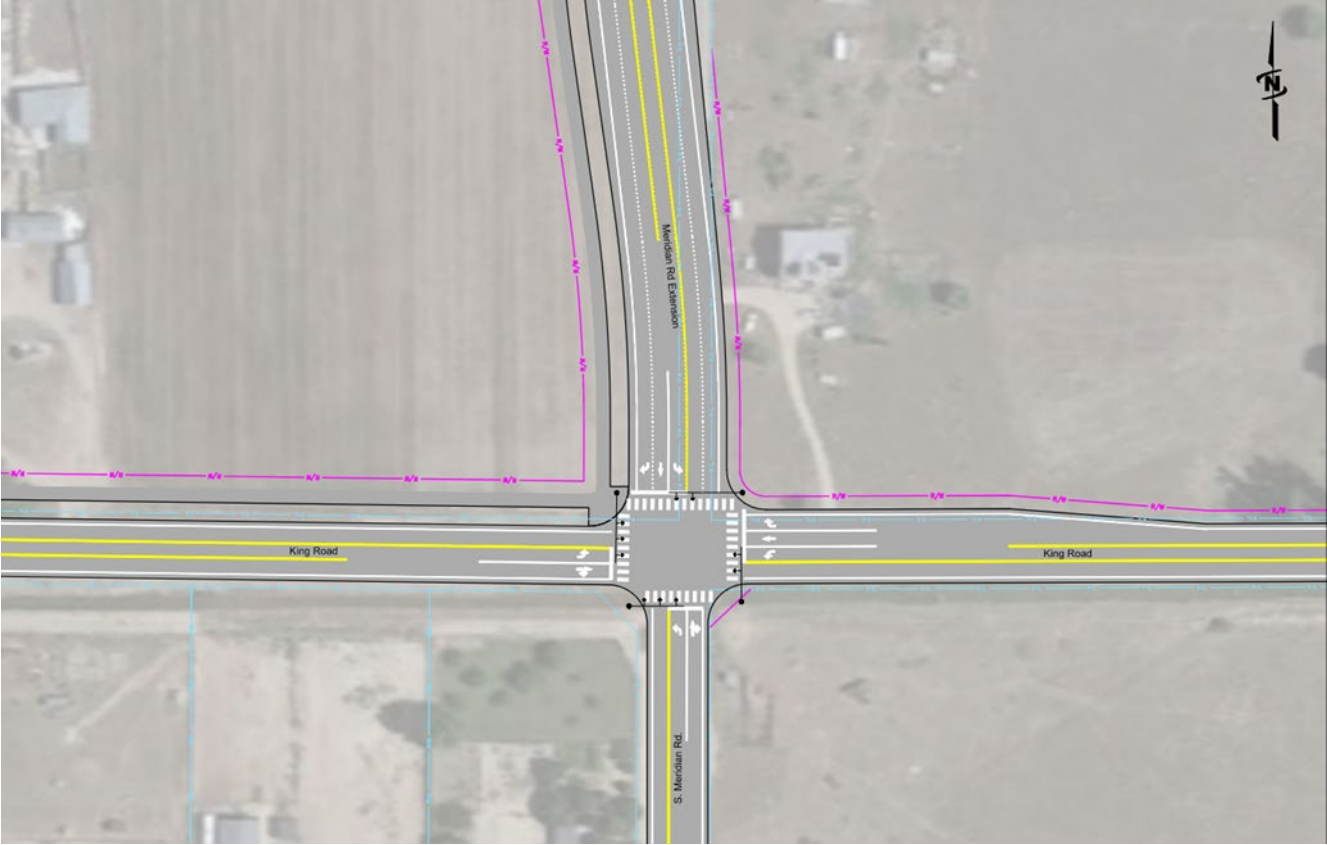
Proposed signalized intersection configuration at Meridian Road and King Road
